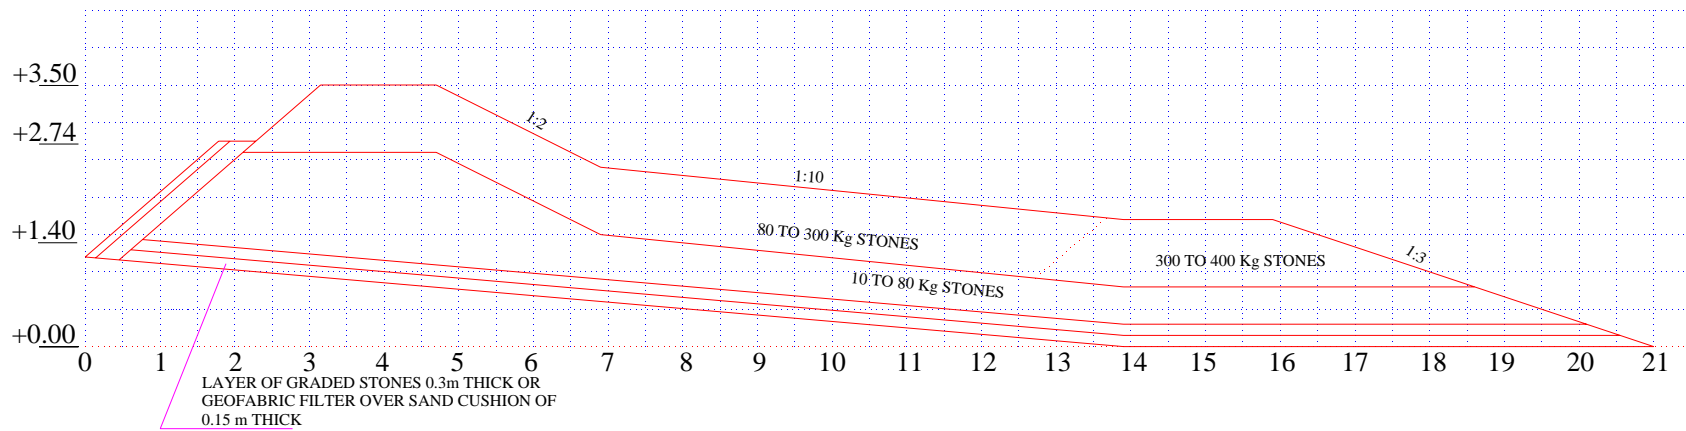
Cross Section of Seawall section suggested by CWPRS
